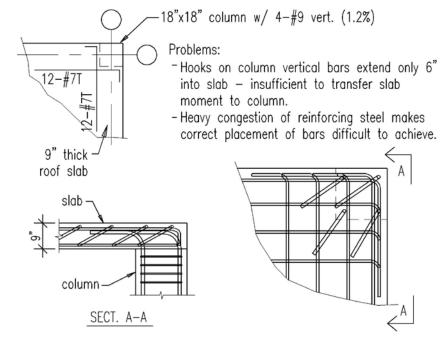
Engineers must consider whether reinforcing steel can be installed and properly developed.
